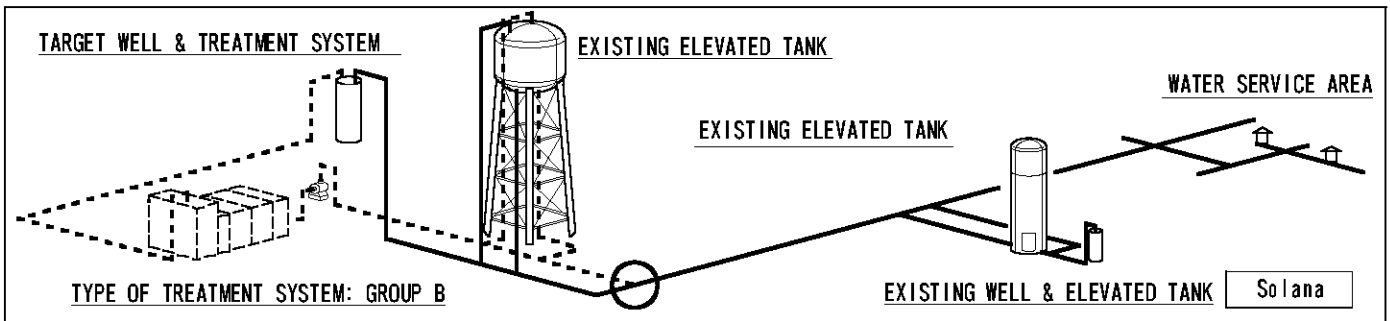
SYSTEM TO BE CONSTRUCTED -①
